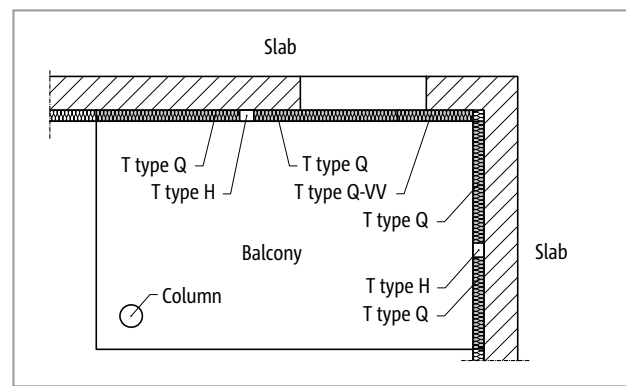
Schöck Isokorb® T type H: Balcony supported on two sides with column
